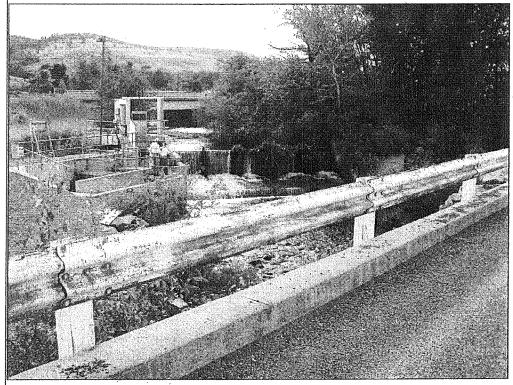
This photo was taken from the Taneum Road bridge, looking upstream at Bruton Dam and associated fish screen and fishway. The westbound bridge of Interstate 90 is also shown, upstream of the Bruton Diversion (about 250 feet from the Taneum Road bridge).
